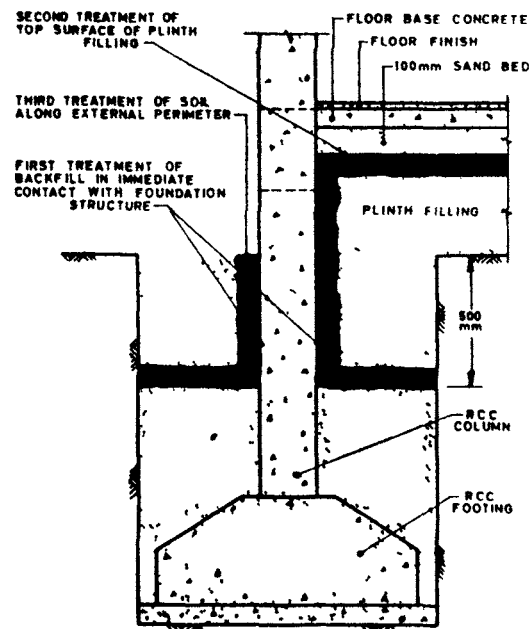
TREATMENT FOR RCC FRAMED STRUCTURE WITH COLUMNS AND PLINTH BEAMS
